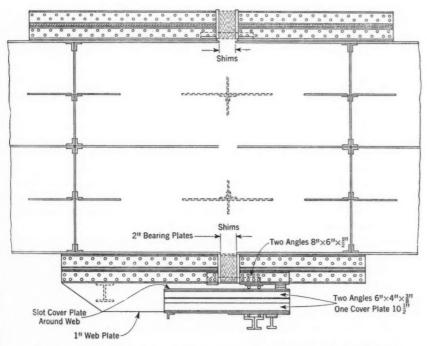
Section on the Center Line of the Arch Rib Showing Jacking Devices
